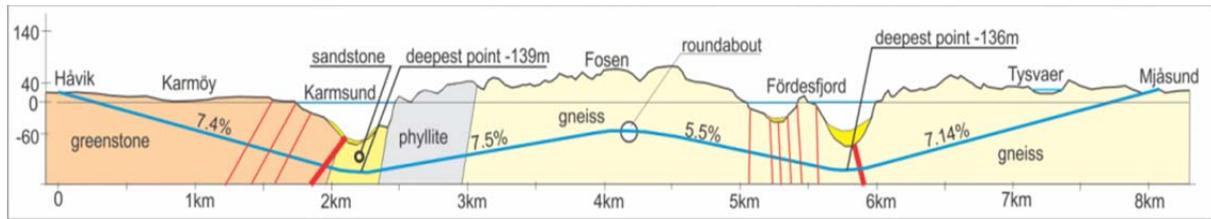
Longitudinal profile with geology of the T-connection subsea tunnels. Red lines indicate the main weakness zones encountered during tunnelling.
